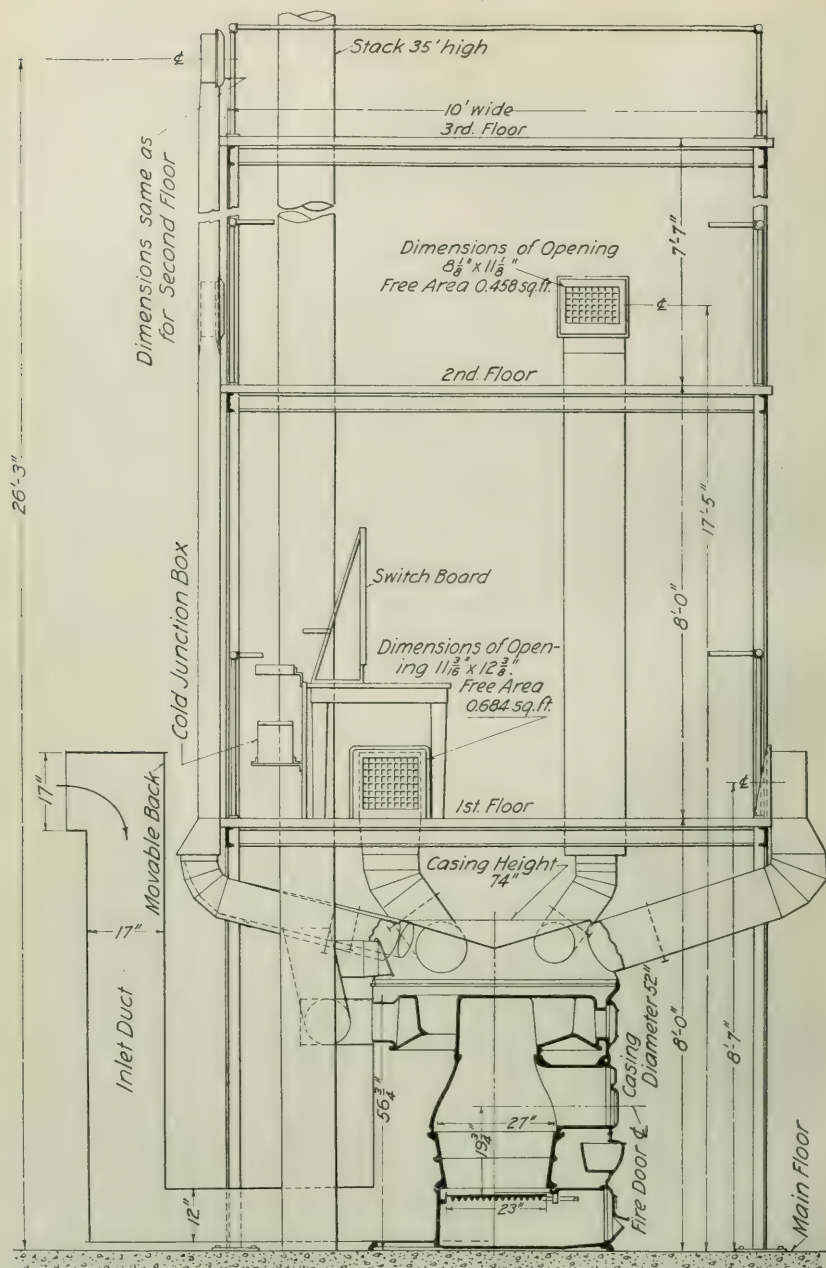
SECTIONAL ELEVATION OF FURNACE TESTING PLANT
